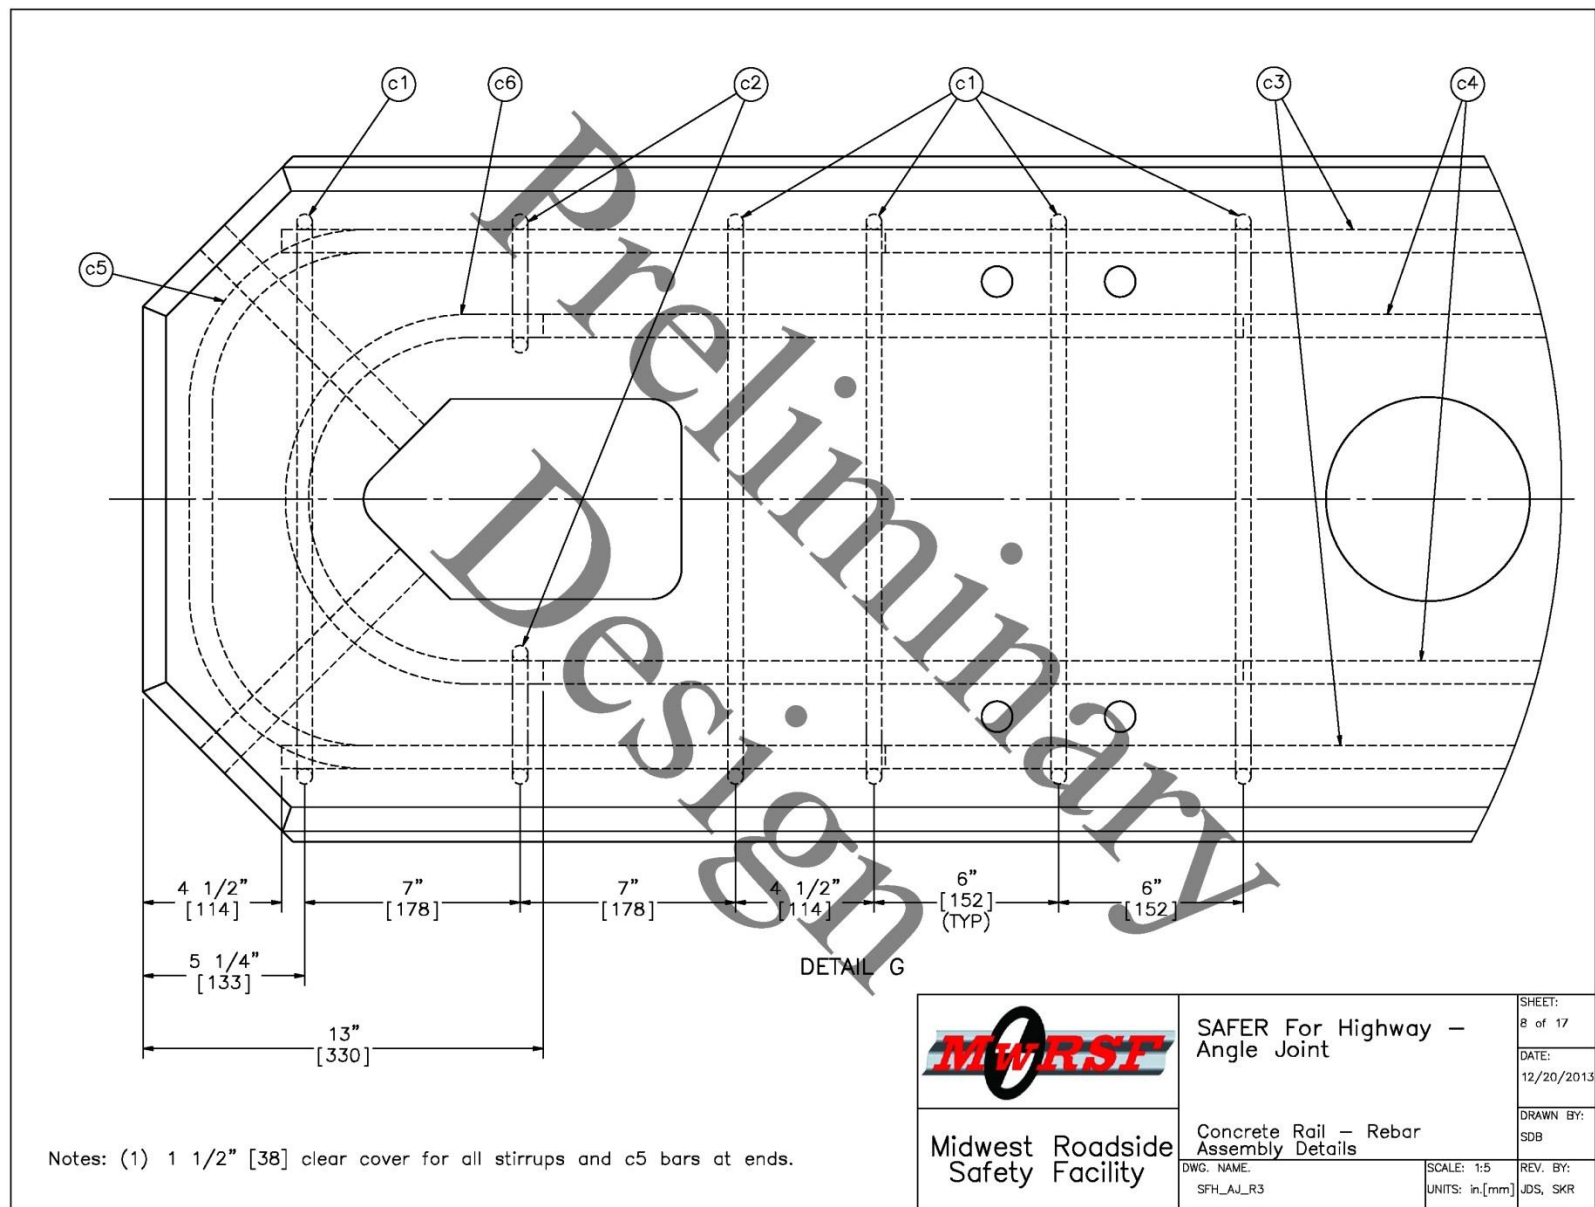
Preliminary Barrier Design, Rebar Assembly Details
